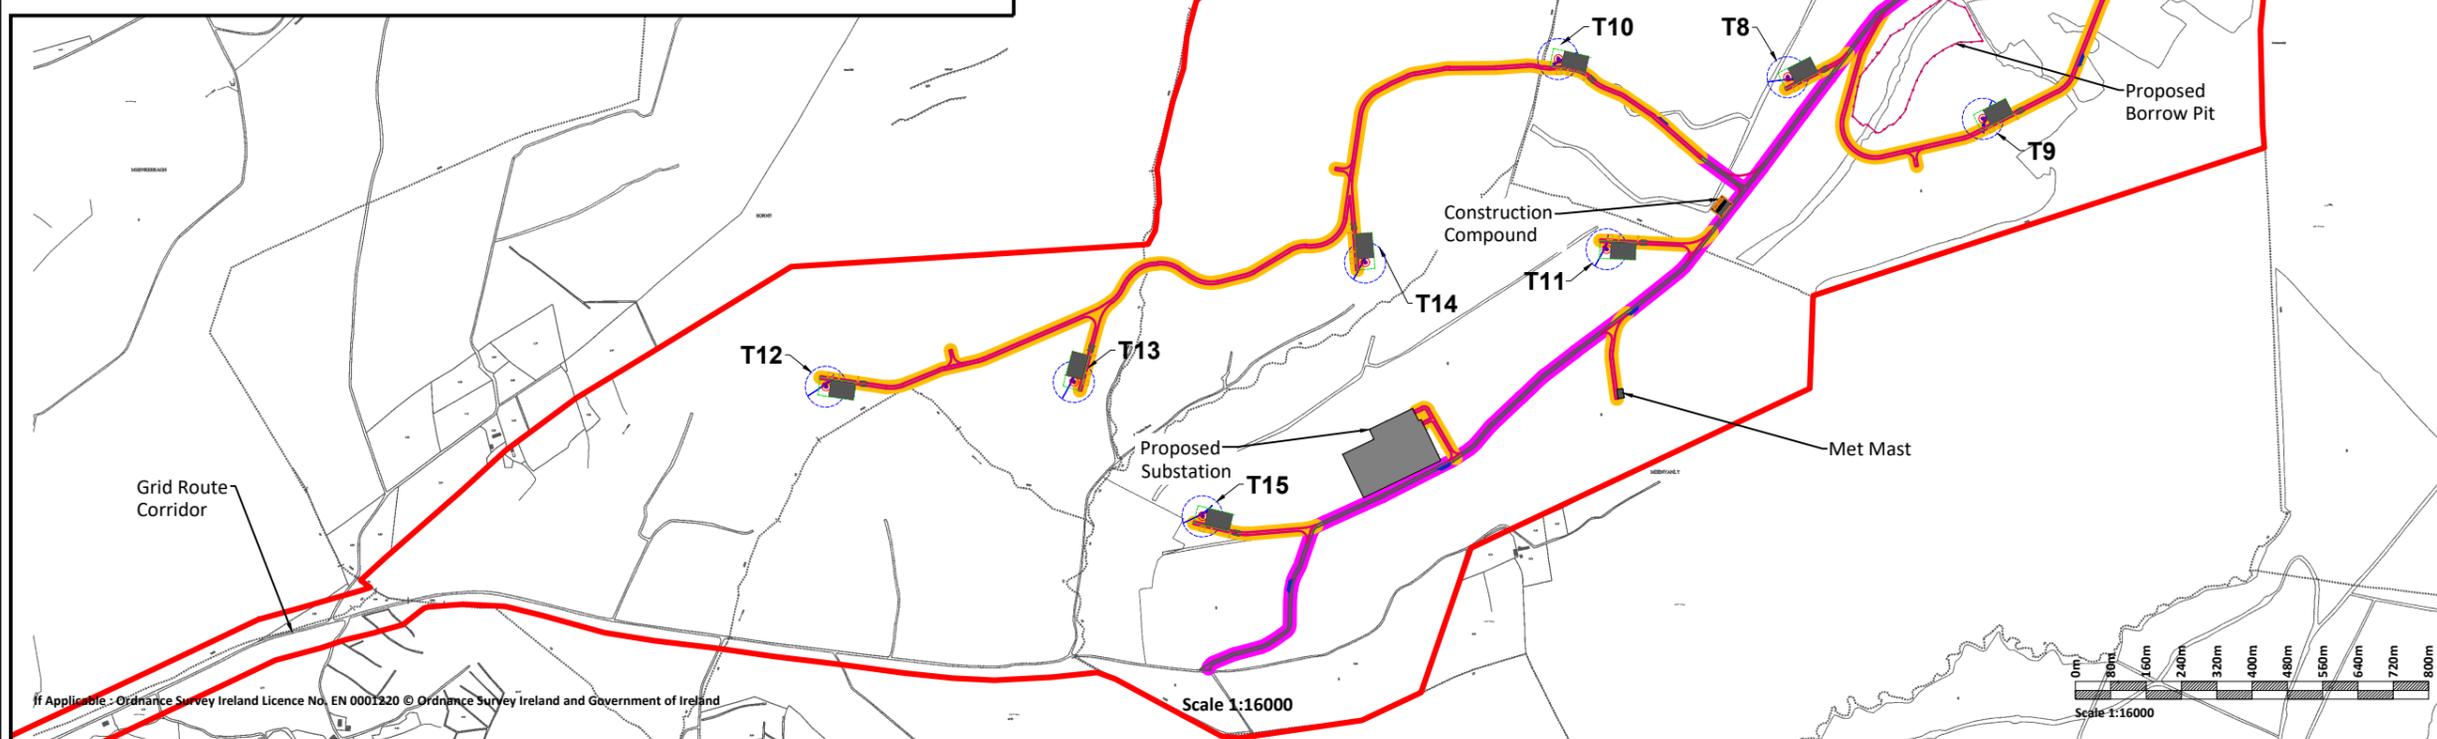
PLAN DRAWING OF WIND FARM WITH ROAD CONSTRUCTION TYPE
